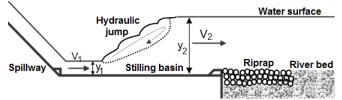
Longitudinal profile of a stilling basin and downstream riprap layer protection.
